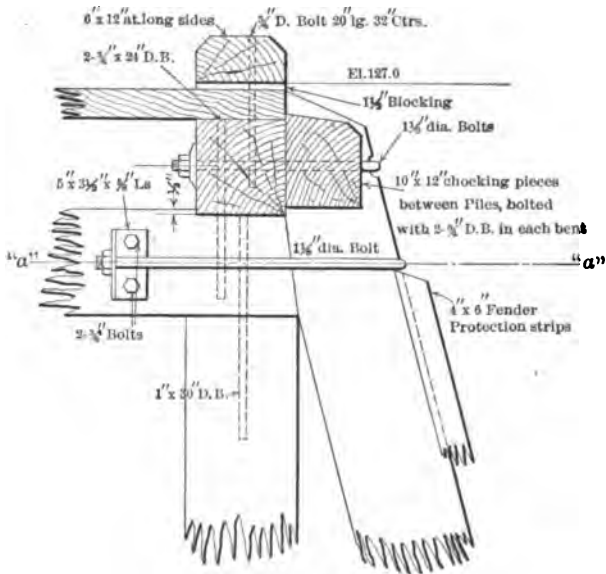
PIER AT NAVY YARD, CORNER DETAIL.
